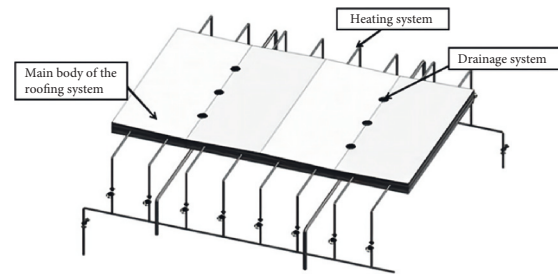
Overall diagram of the anti-leakage system of reinforced concrete flat roofs constructed in cold regions.
